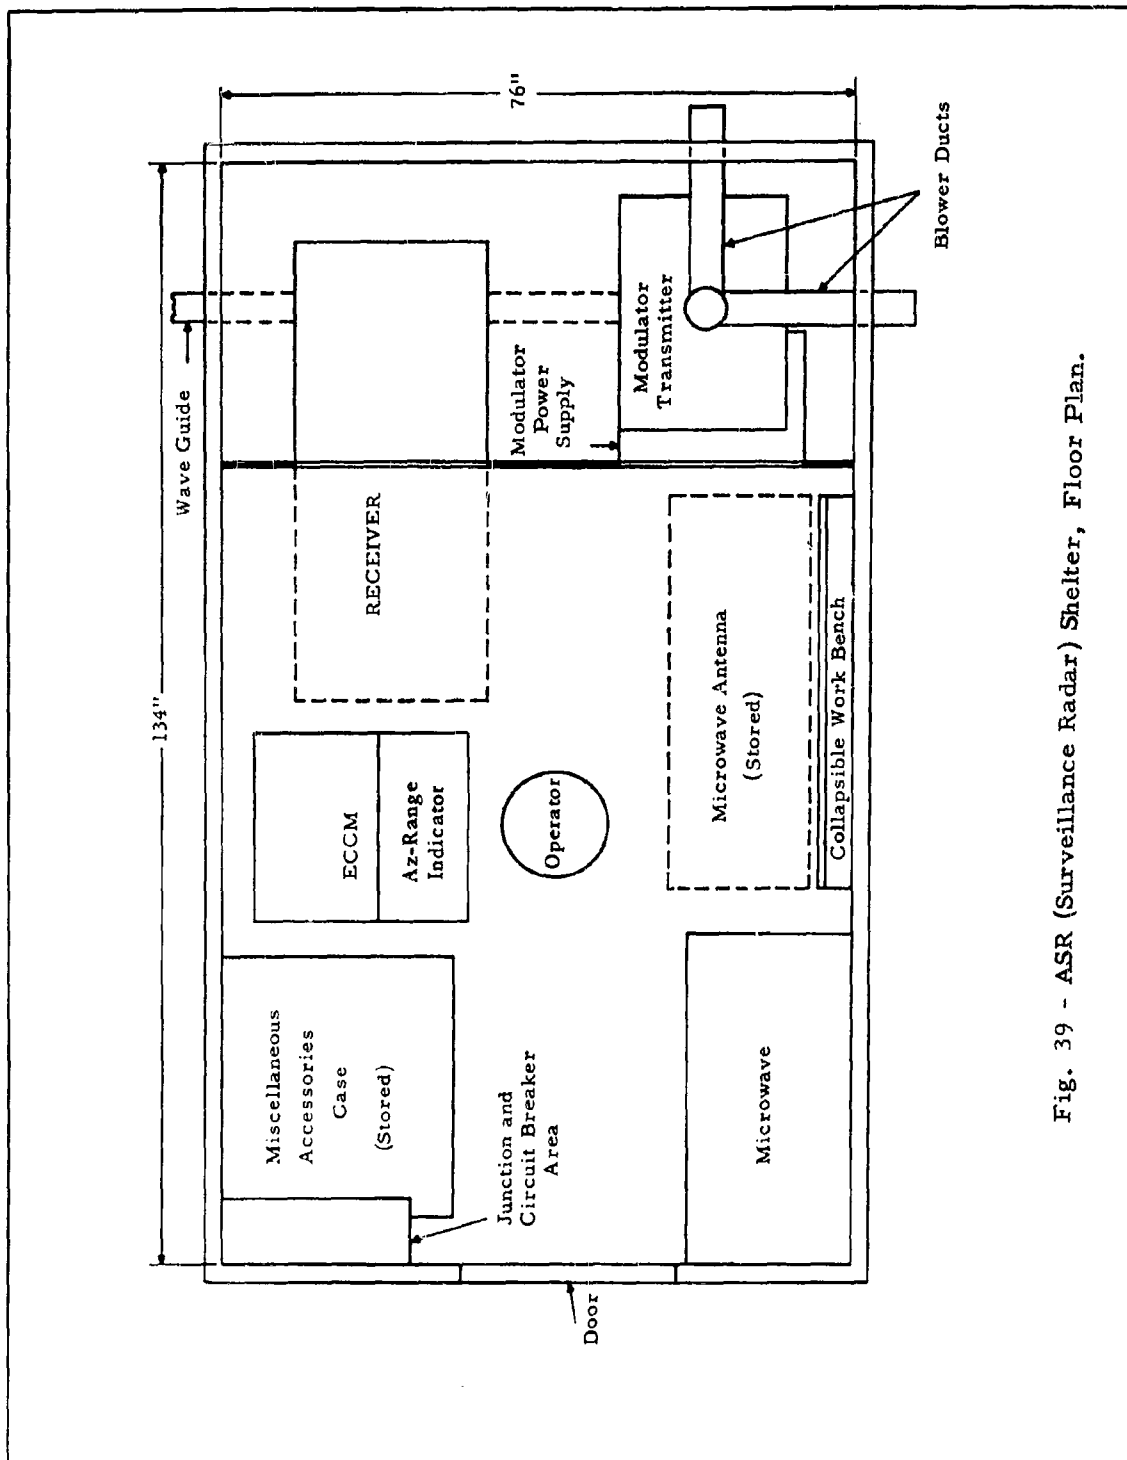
ASR (Surveillance Radar) Shelter, Floor Plan.
